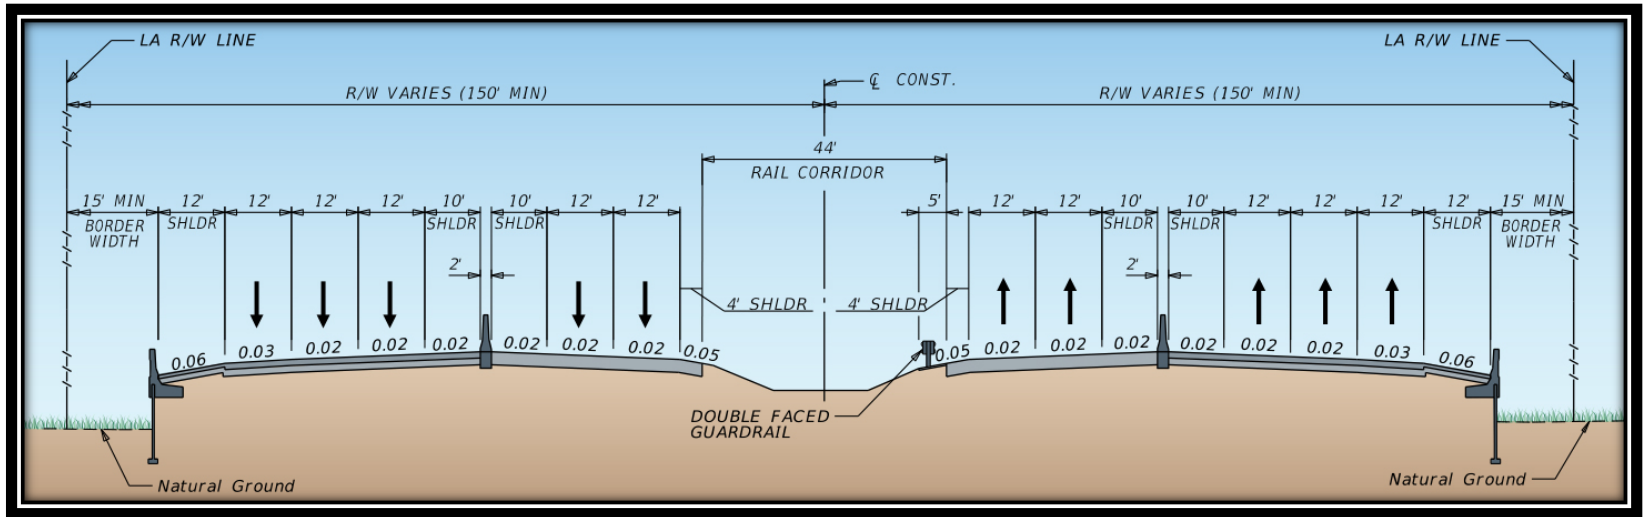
Proposed Typical Section (6+4 with rail envelope) – E. of Central Florida Parkway to SR 528
